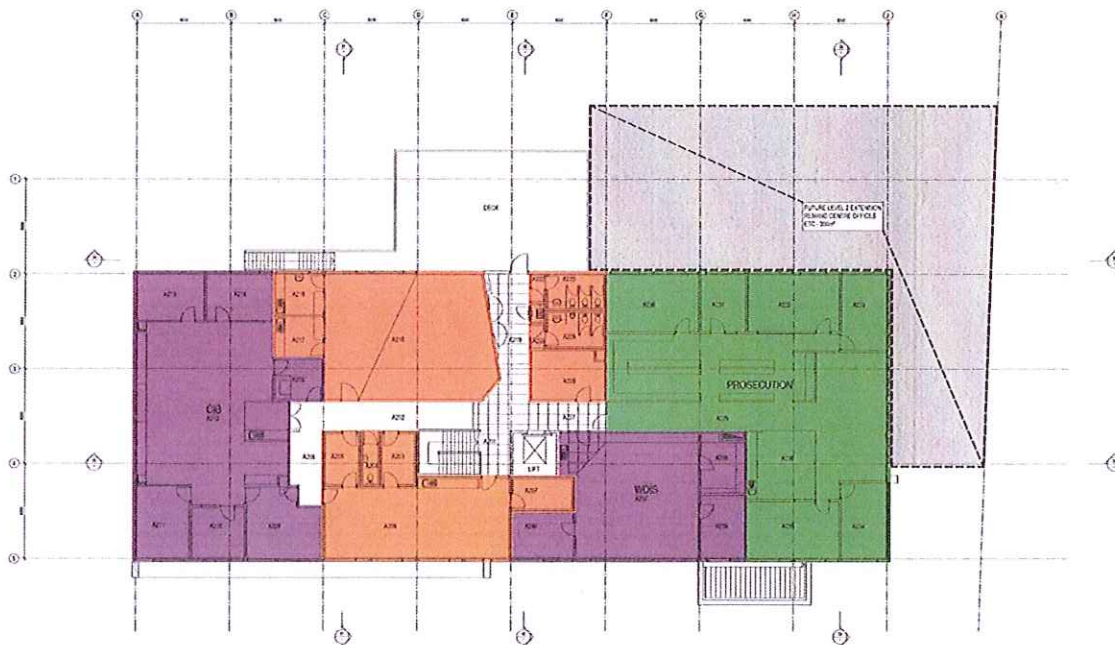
Floor Plan – New Station – future expansion shown in grey shade
